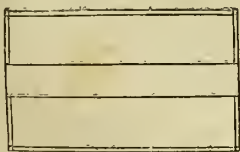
PLAN OF STAGES FOR NARROW SPAN HOUSES.
